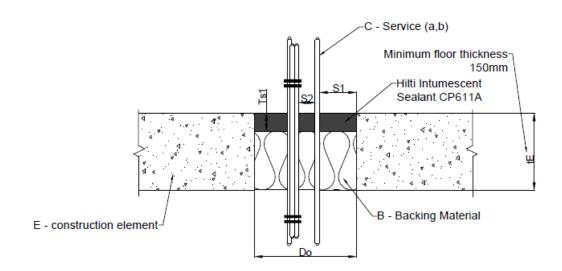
Side View, seal type 17, small cables ≤ 16mm and cable bundles ≤ 16mm in concrete floor ≥ 150mm
